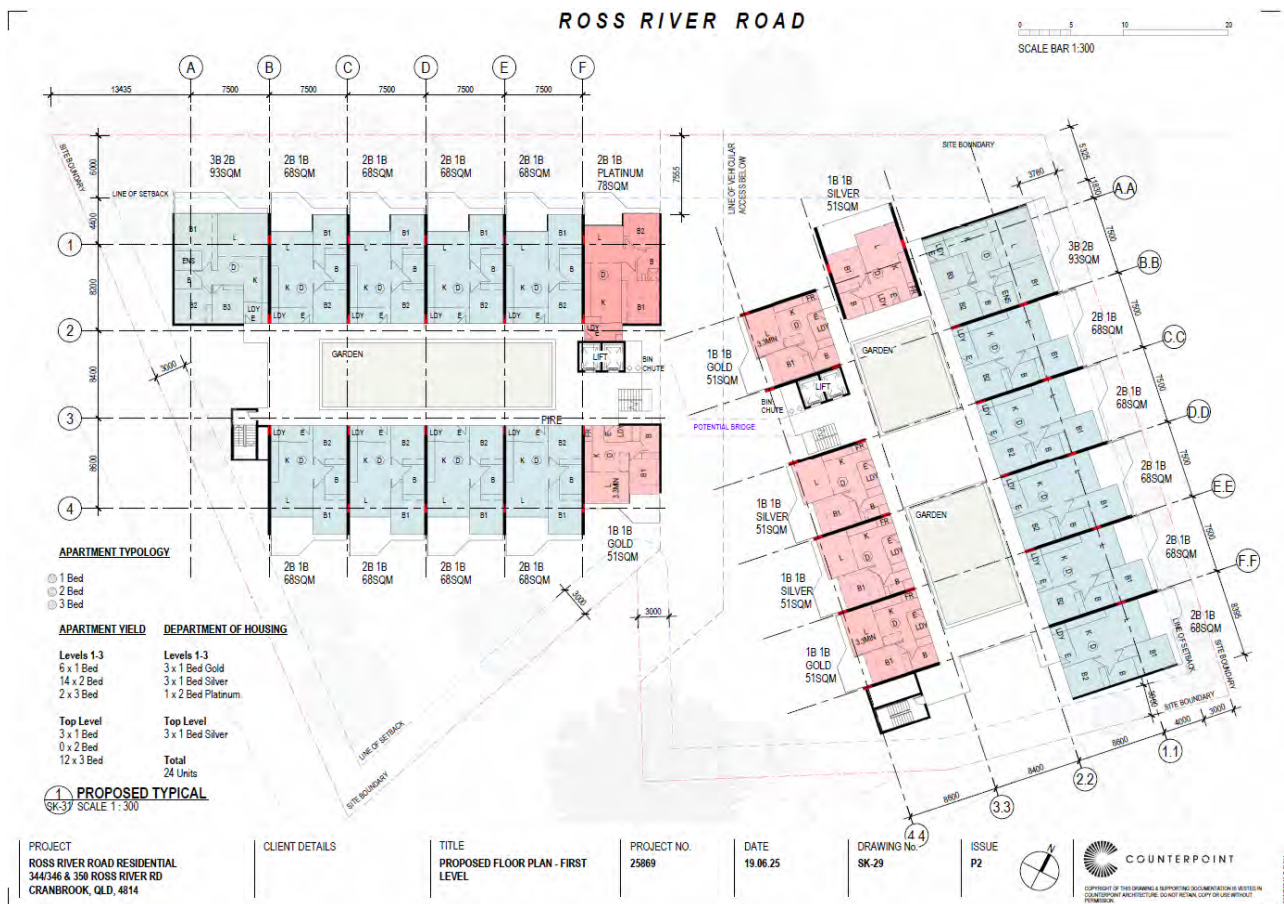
Development Layout Plan (Level 1 to 3)
